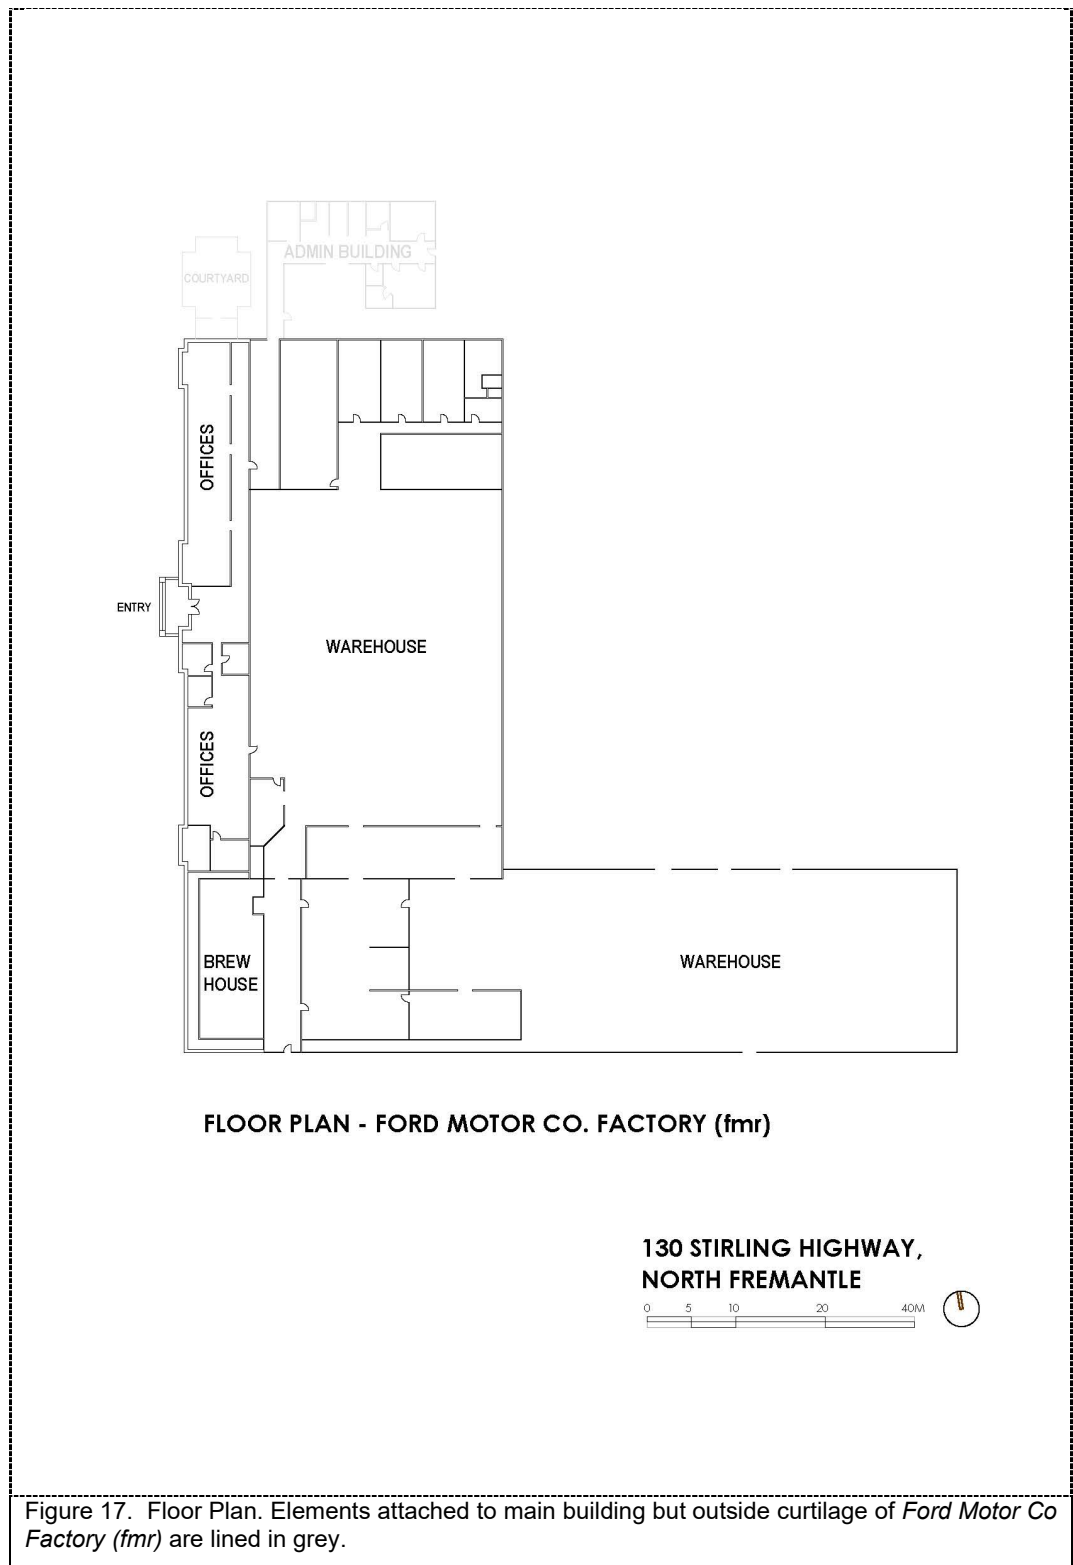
Floor Plan. Elements attached to main building but outside curtilage of *Ford Motor Co Factory (fmr)* are lined in grey.
